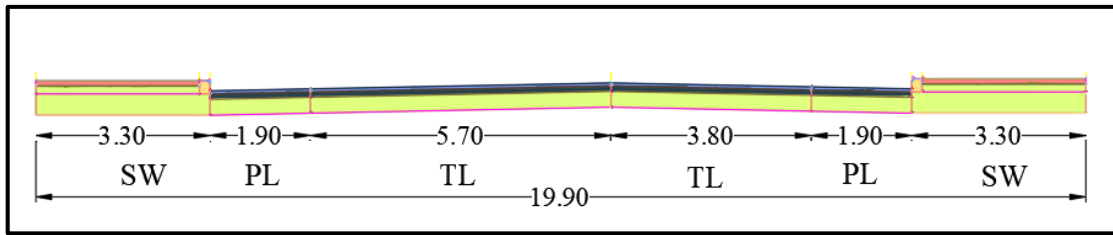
At Abu Asfoura Restaurants Section No.2 Existing Cross Section
